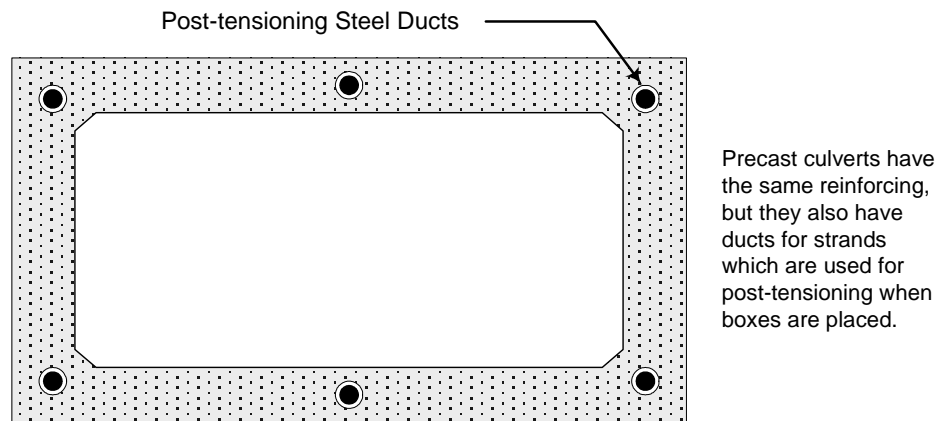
Precast Box Sections with Post-tensioning Steel Ducts
